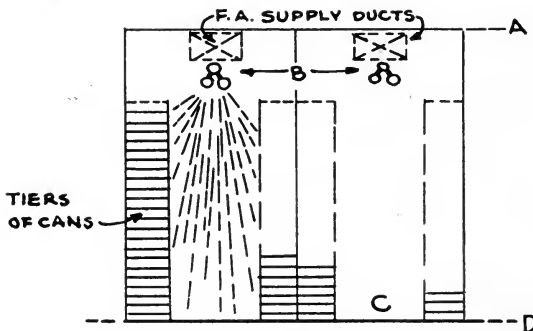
End-view elevation. A, roof line; B, water sprinklers; C, vault aisle; D, floor line.
